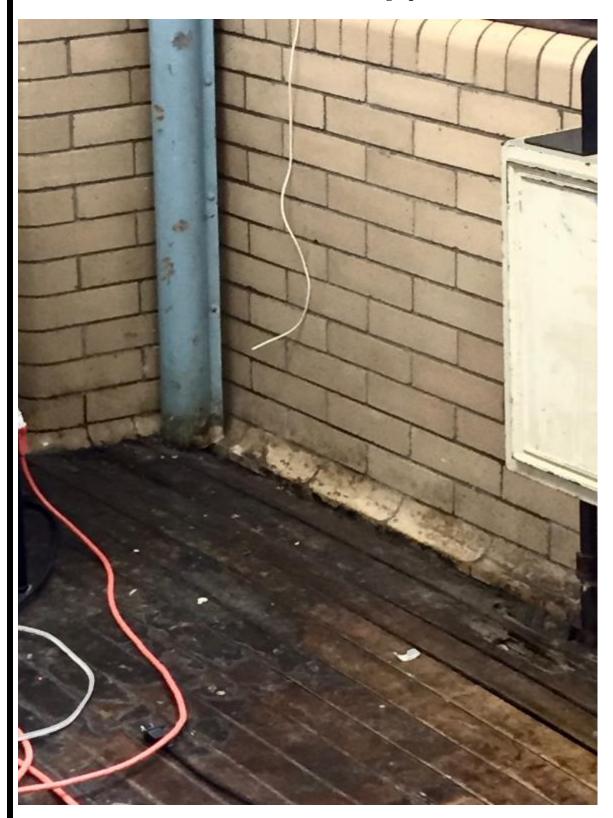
Beeber MS - 12.13.2016 - Room 101 - Steam Leak at Radiator - Floor Damage
